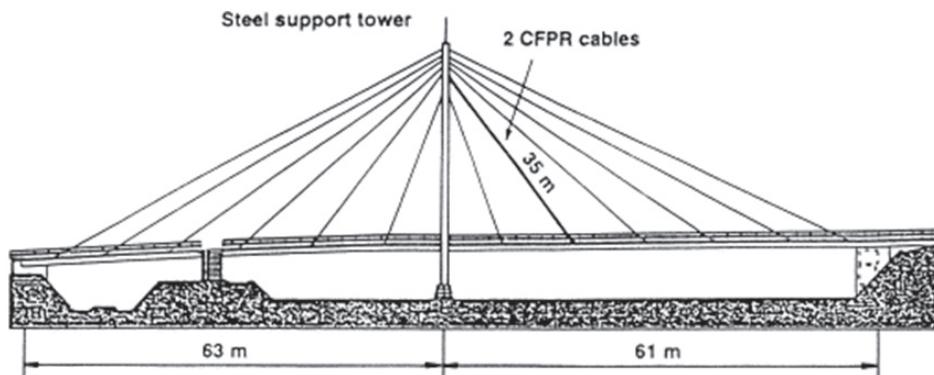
Cable-stayed bridge in Winterthur, Switzerland
